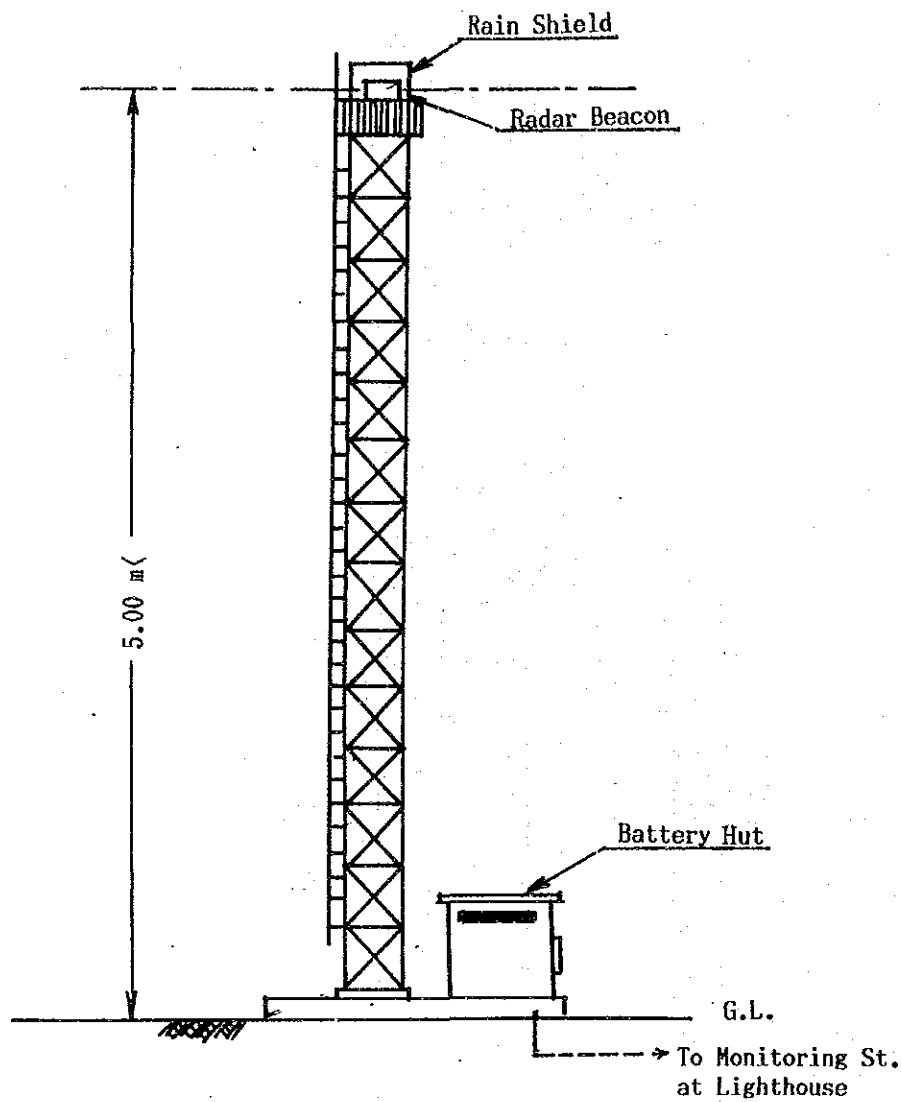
Radar Beacon Station (Installation Plan)
